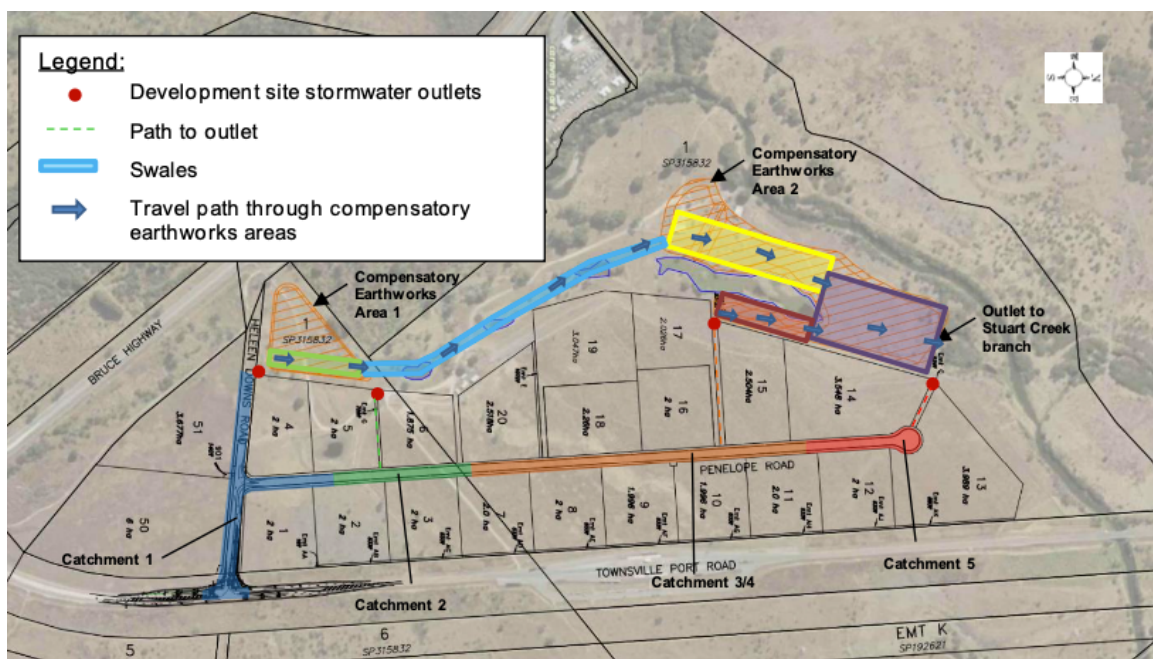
Revised Modelled Drainage Plan for CBIP (Western Precinct)
